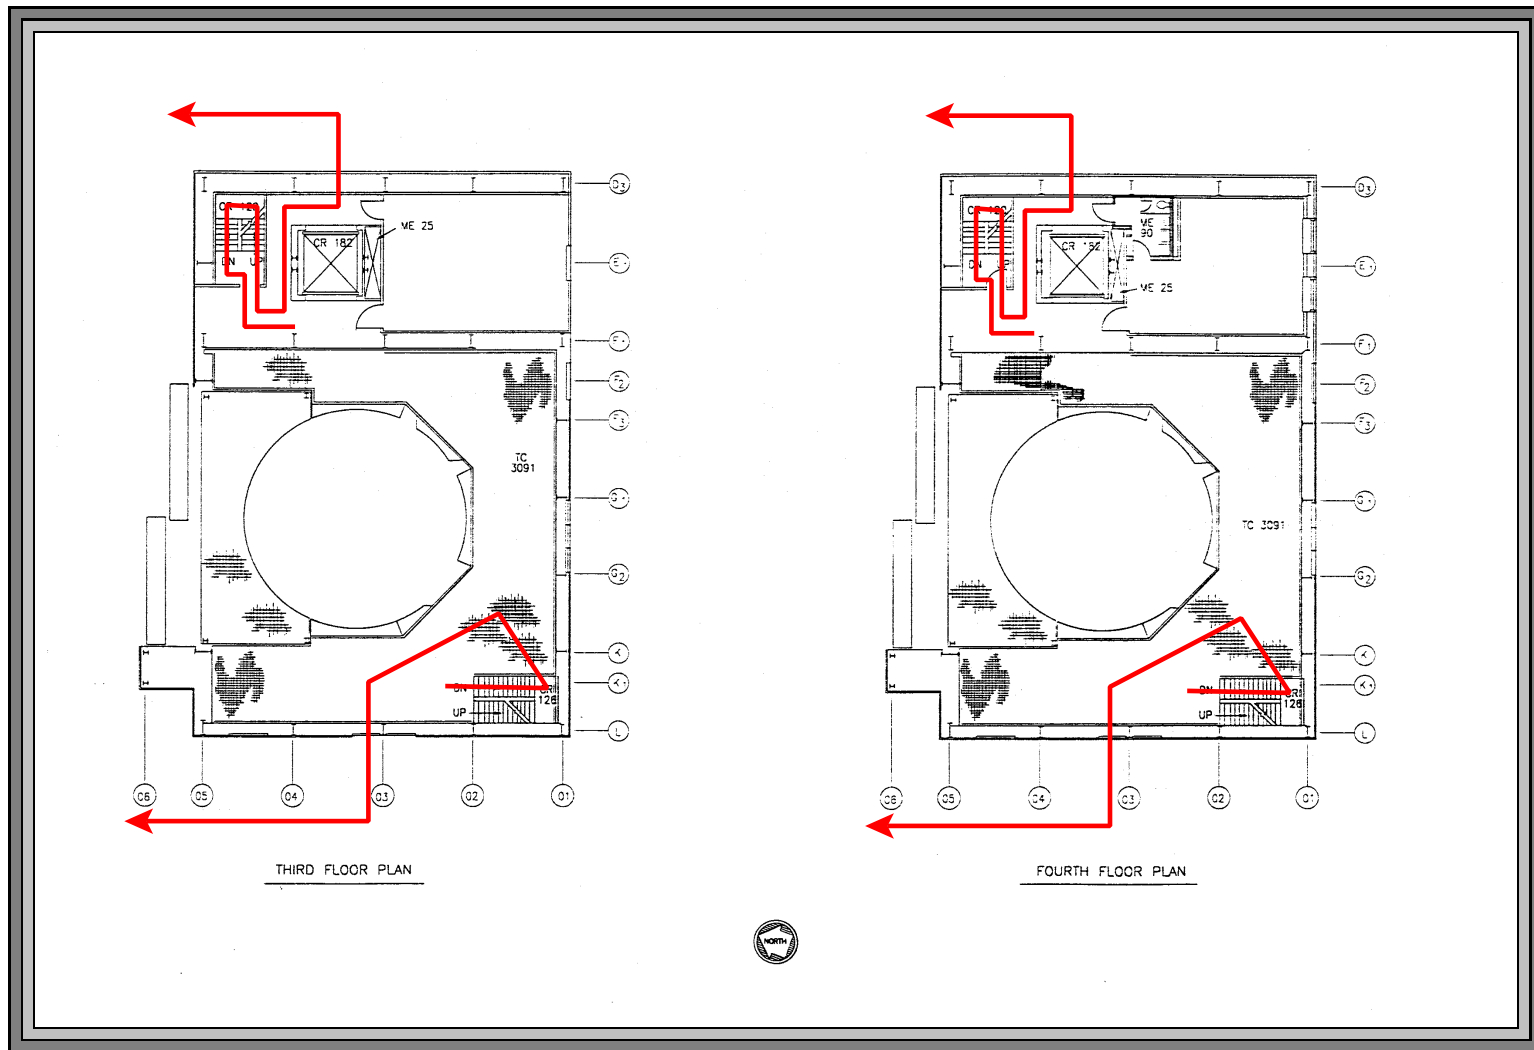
Figure D. Emergency evacuation routes via the east and west stairwells and ground floor exit doors from levels 3 and 4 of the NMFS-SSC facility located in building 3203.
